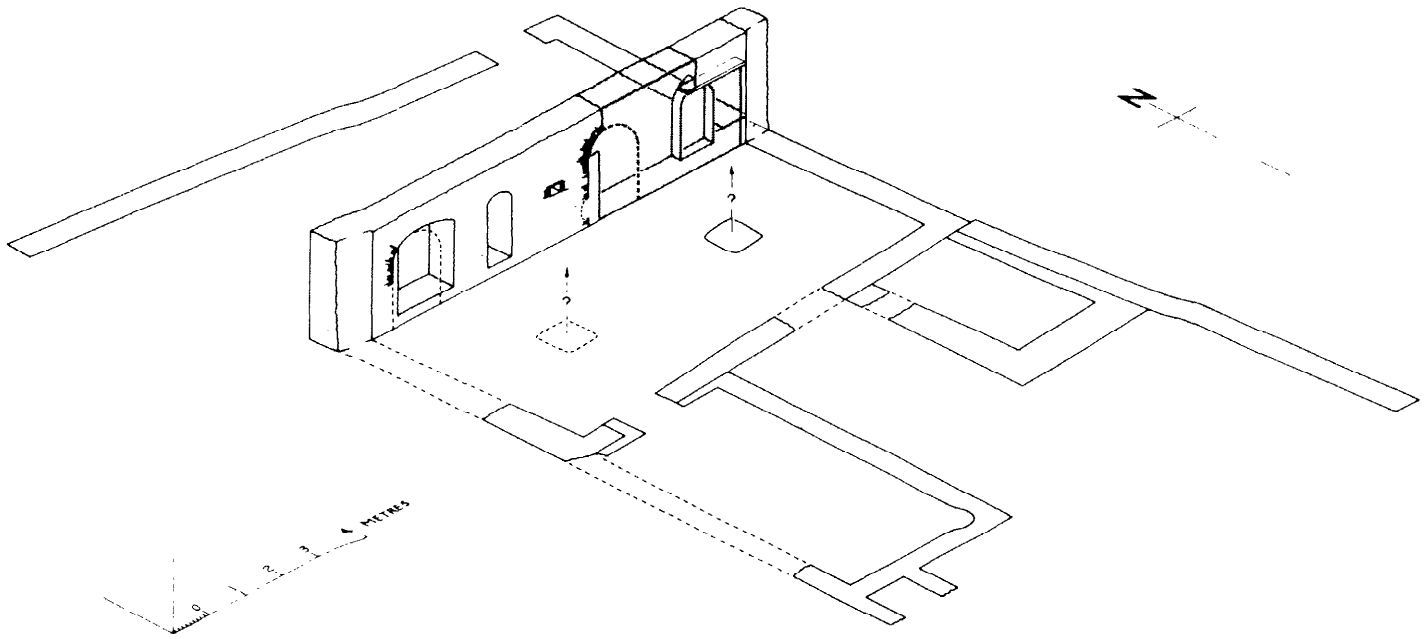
Lion Walk stone house. Isometric drawing. Grey indicates later rebuilding in stone
